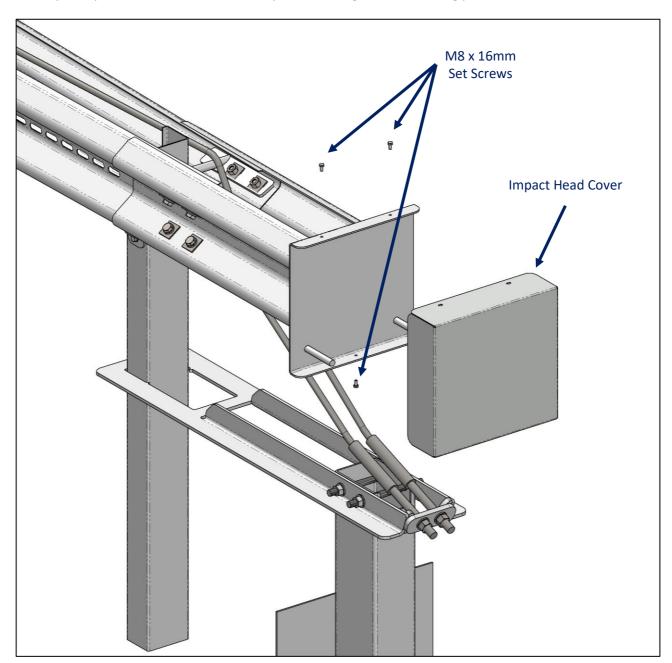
Assembled View of Cable Assemblies at nose of terminal
